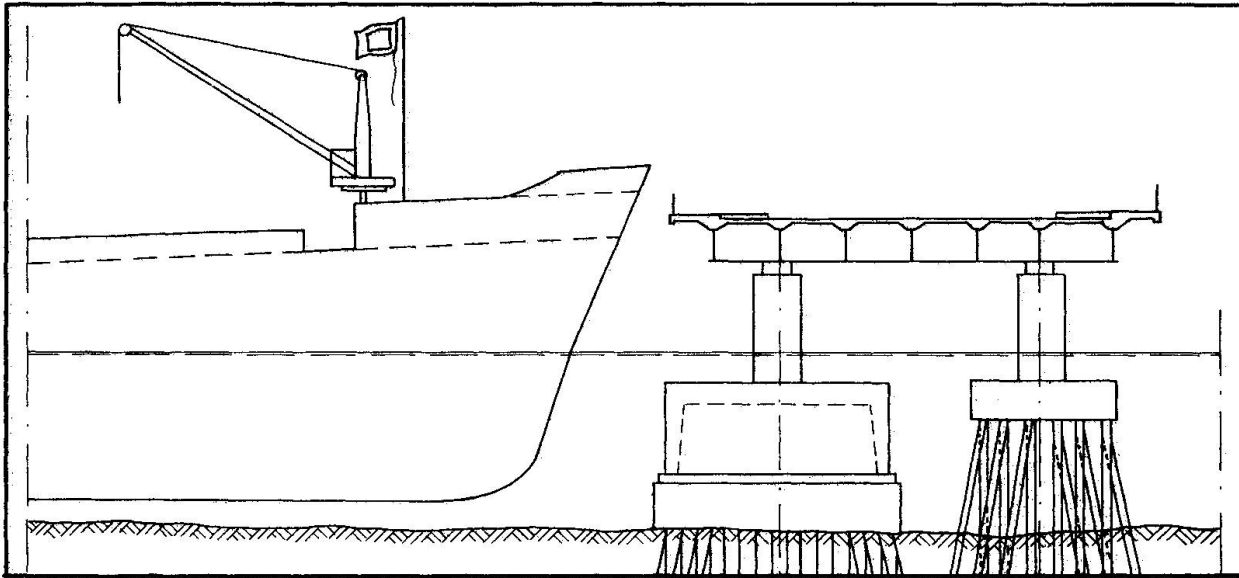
Bridge cross-section and the bow of a coal-carrying ship.
